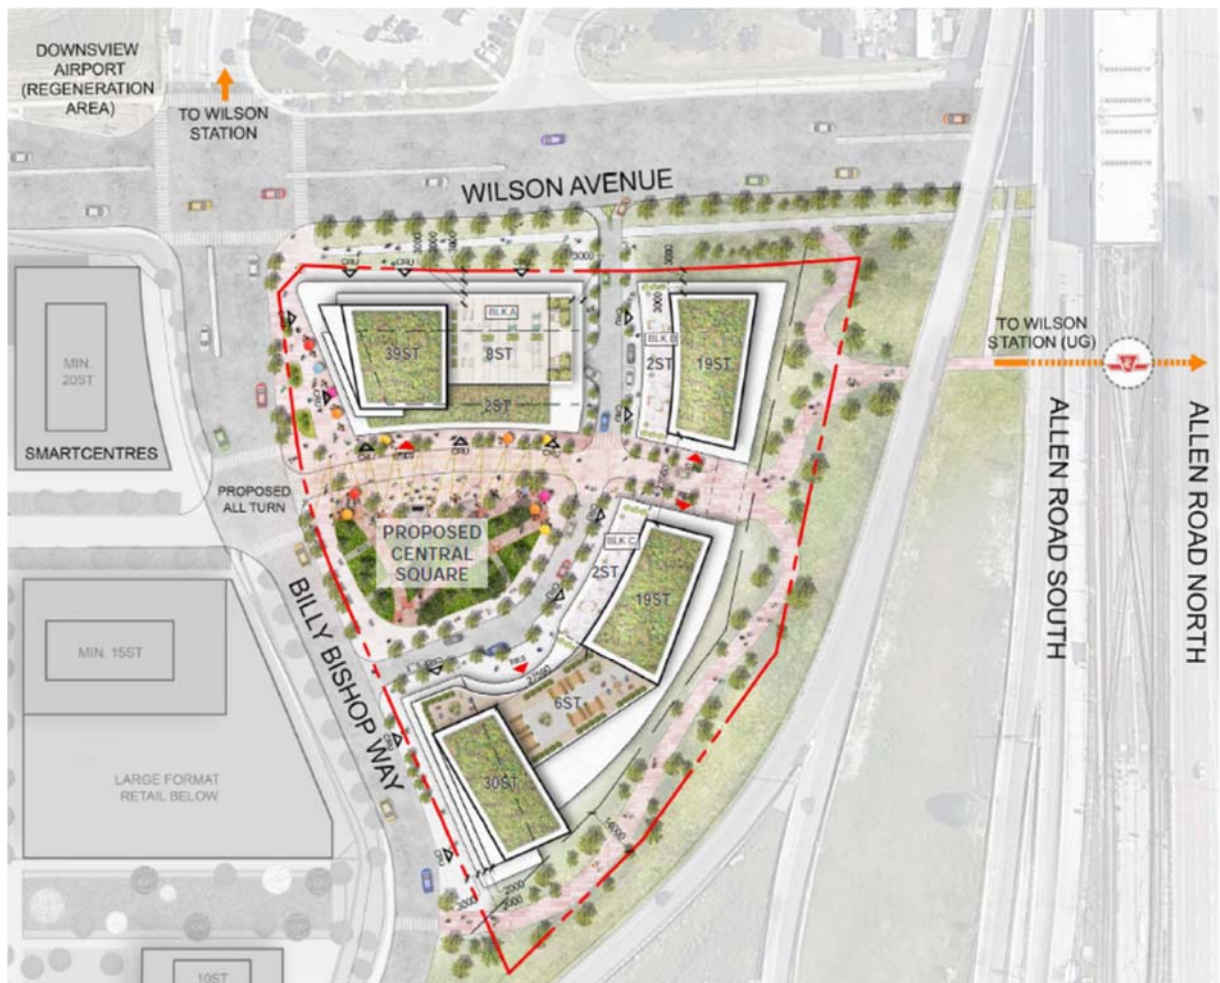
Conceptual Plan showing Possible Mixed Use Development
